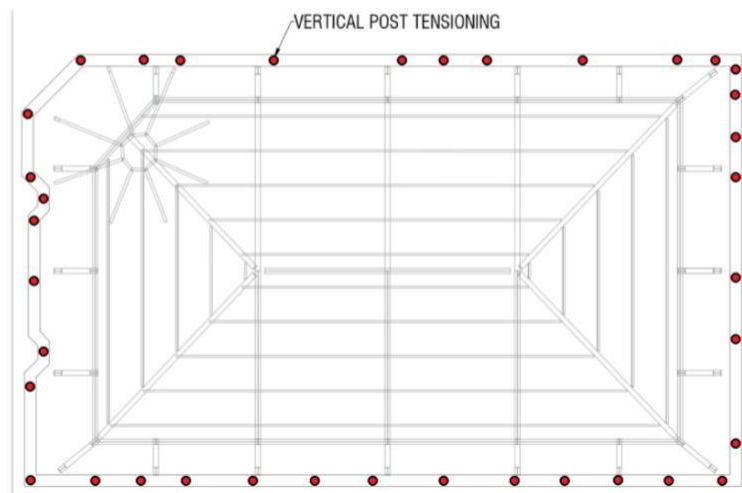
Plan view of the vertical post-tensioning rods around the perimeter of the building
